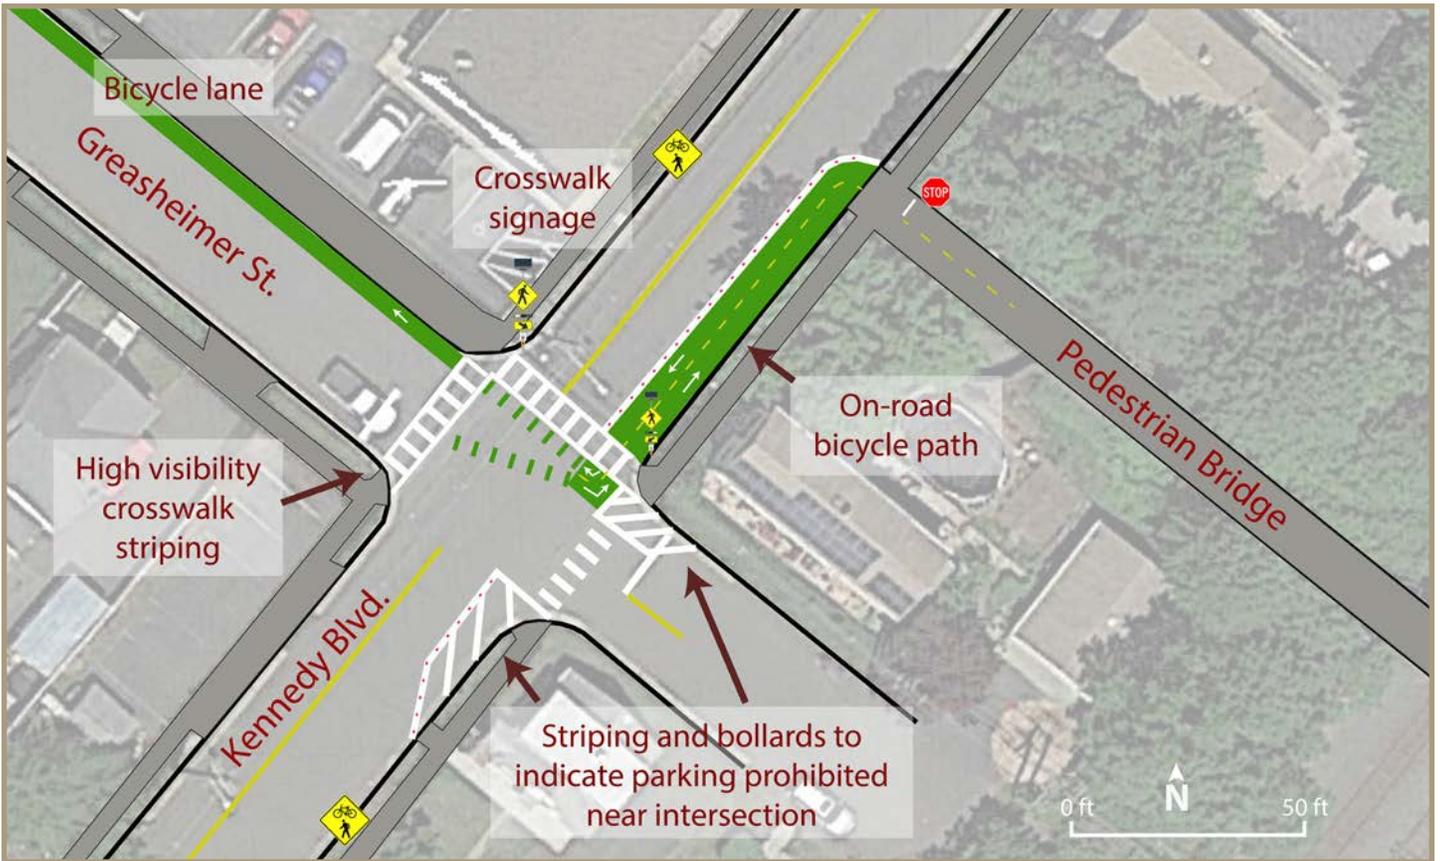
Proposed improvements to the intersection of Kennedy Boulevard and N. Greasheimer Street.
